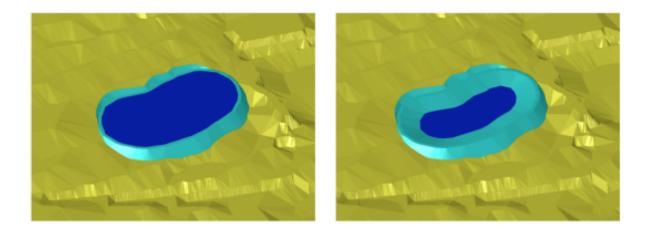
Full 100-year storm pond volume and normal pond elevation.
